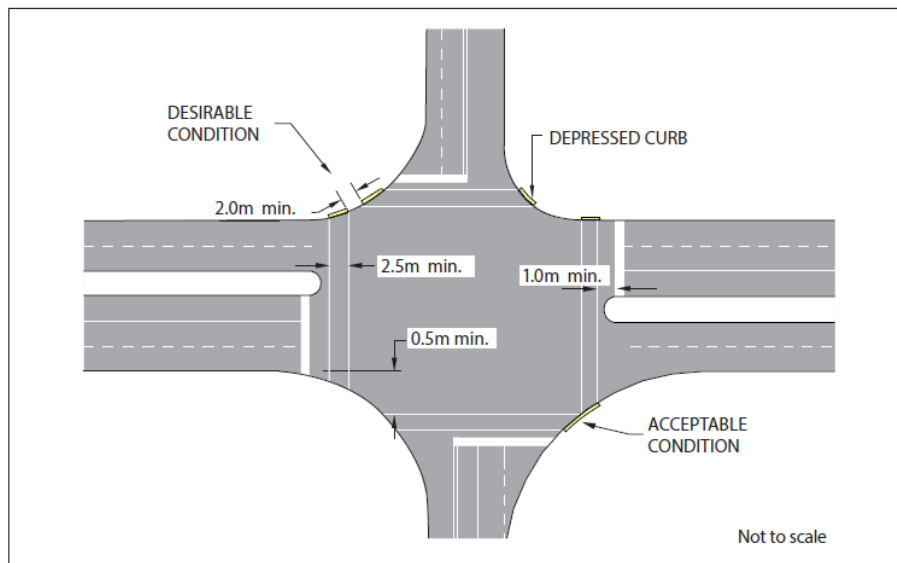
Typical Crosswalk Design with Standard Crosswalk Markings (Source: OTM Book 15)
